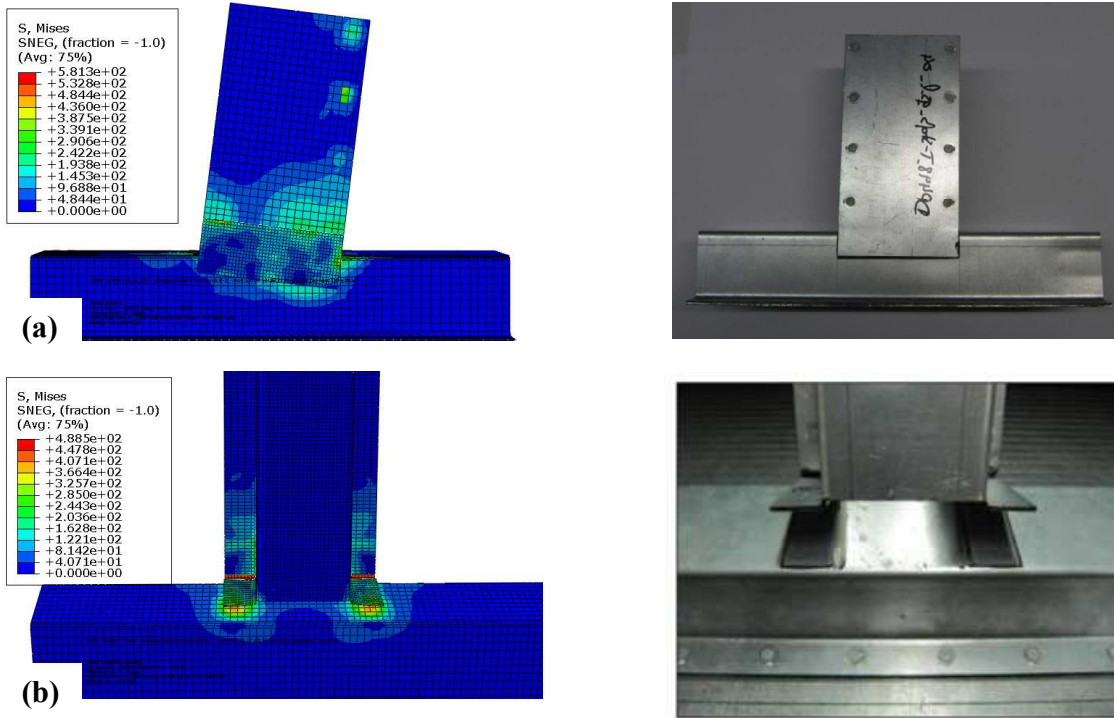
Predicted deformed shape vs. test picture of AB T-joint under (a) longitudinal loading and (b) transverse loading
